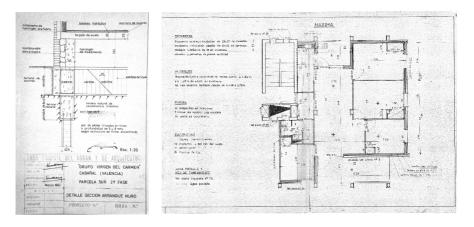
Constructive section and plan with finishing technical specifications, original Project. 1962
